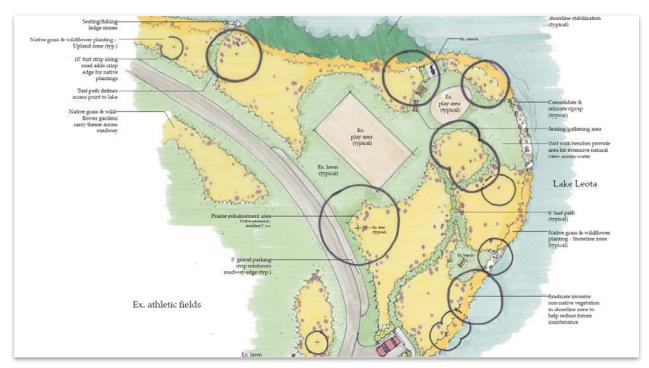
EXCERPT OF 2009 LEONARD LEOTA LANDSCAPE PLAN
